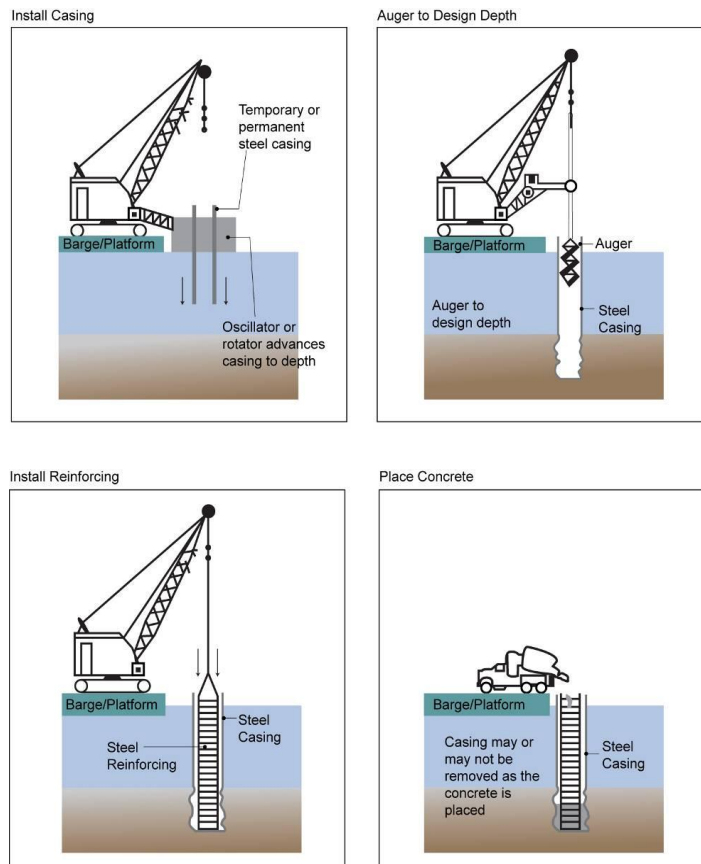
Typical Drilled Shaft Installation from Barge or Platform
